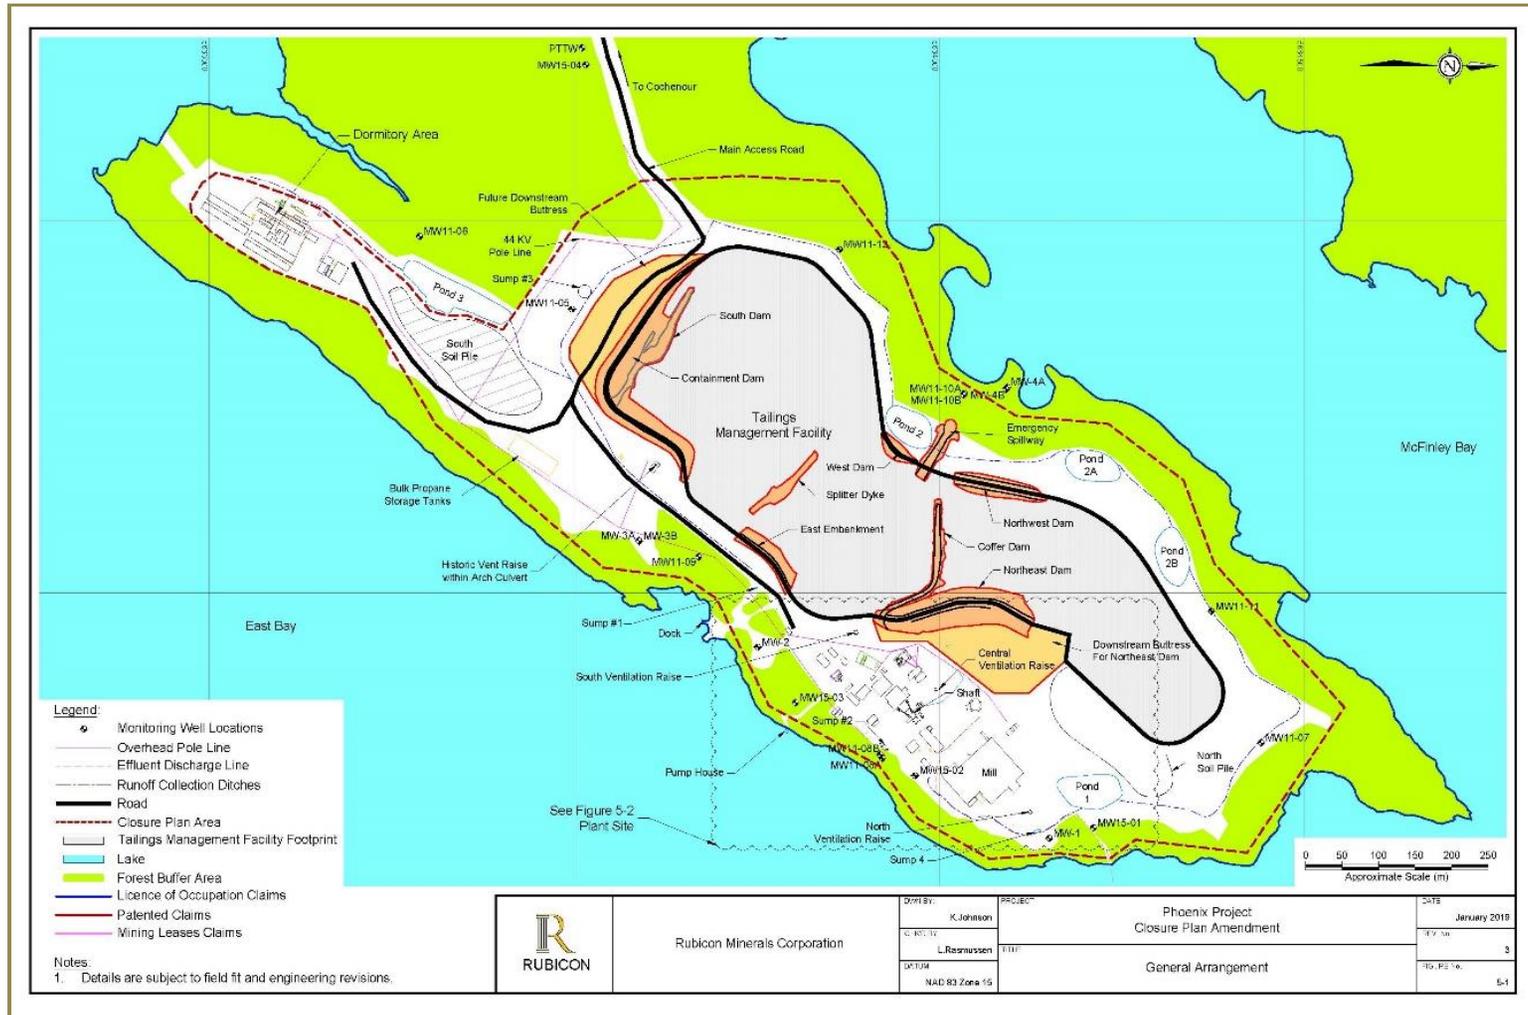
Detailed Site Plan of Project Area (Rubicon, 2019)
